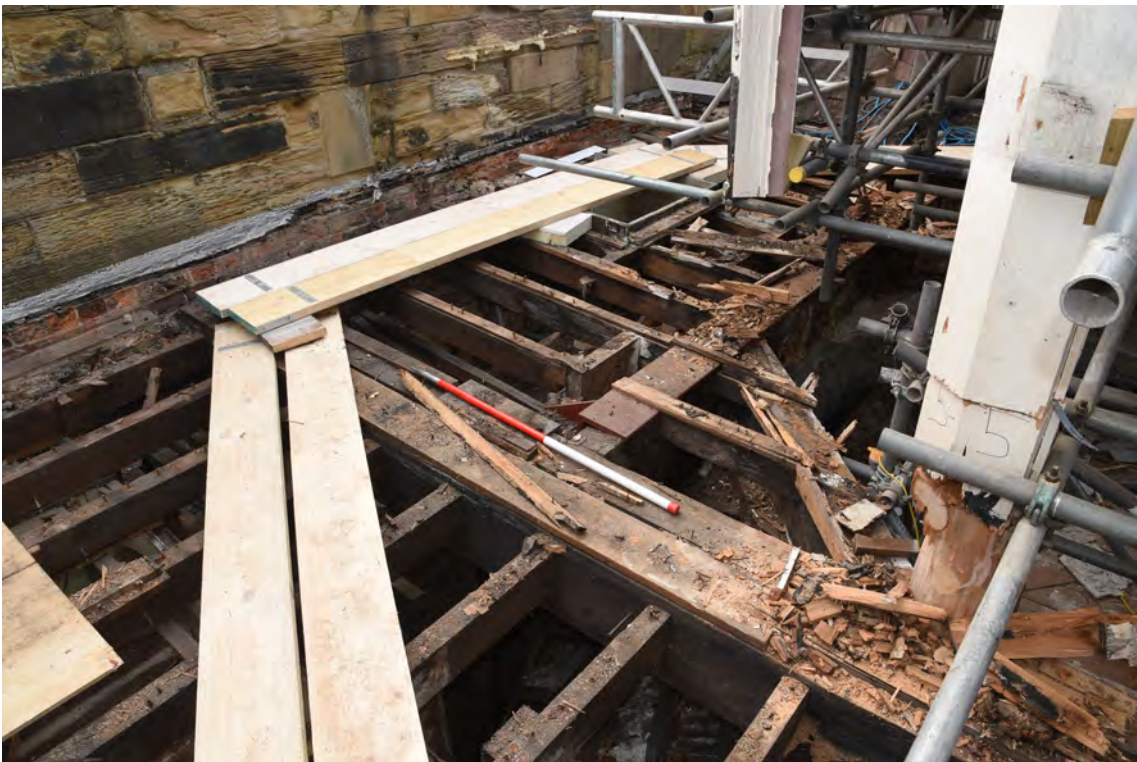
Roof construction following board lift, E side, looking SE, scale 1.0m (BRH123)
